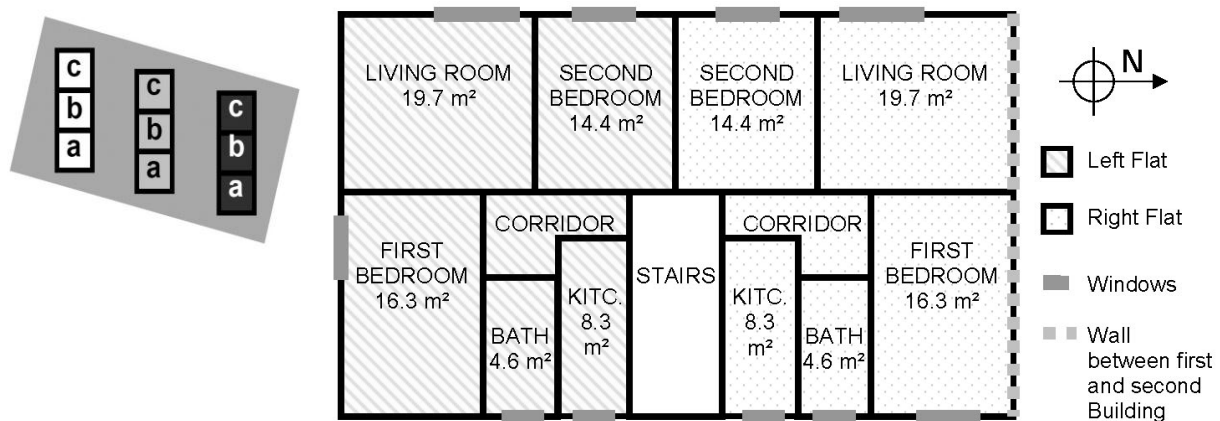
left: Building alignment / right: Qualitative layout of one floor of the first buildings of each block / KITC. is the Kitchen
